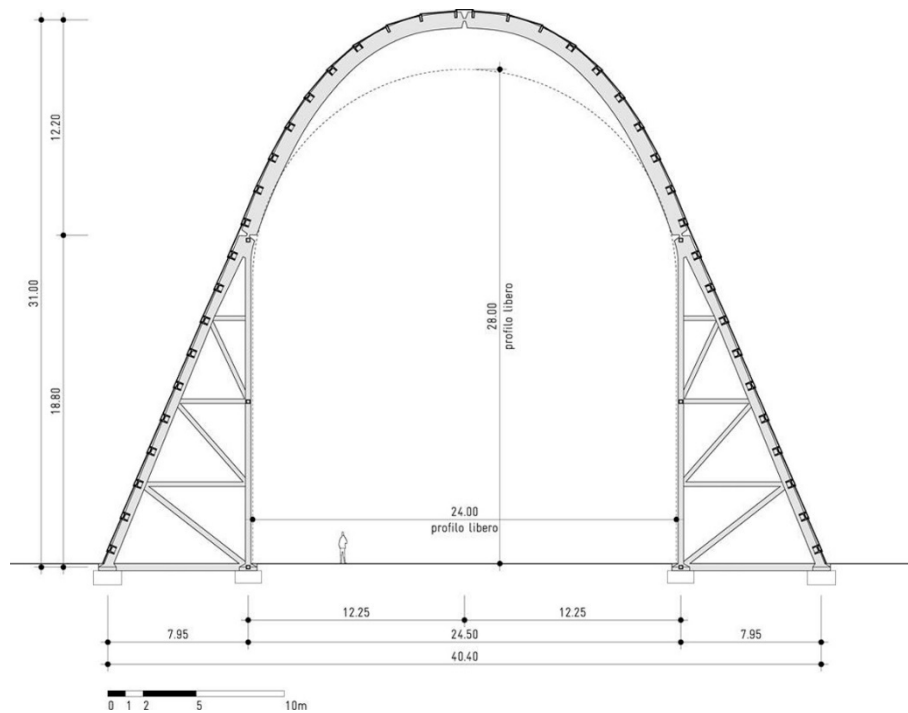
Ecausseville airships hangar. Cross-section (drawing by Roberto Guidotti)
